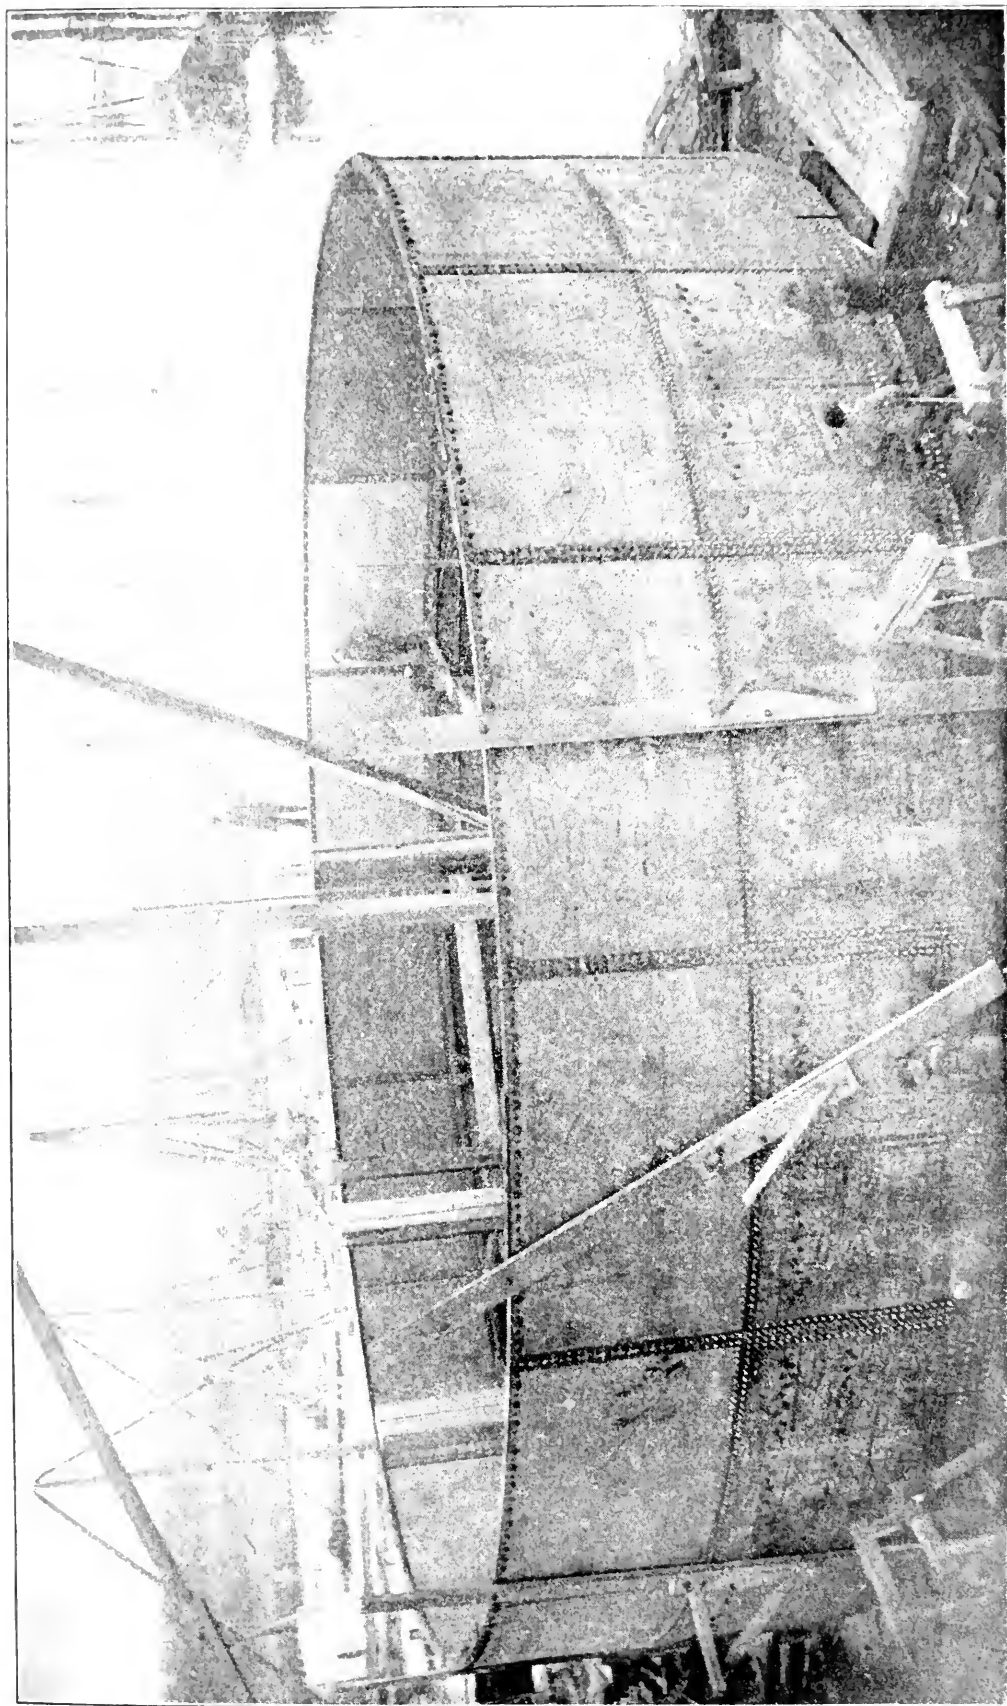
SHELL OF ANNULAR CAISSON FOR PIVOT PIER, 155TH STREET BRIDGE, NEW YORK CITY.
